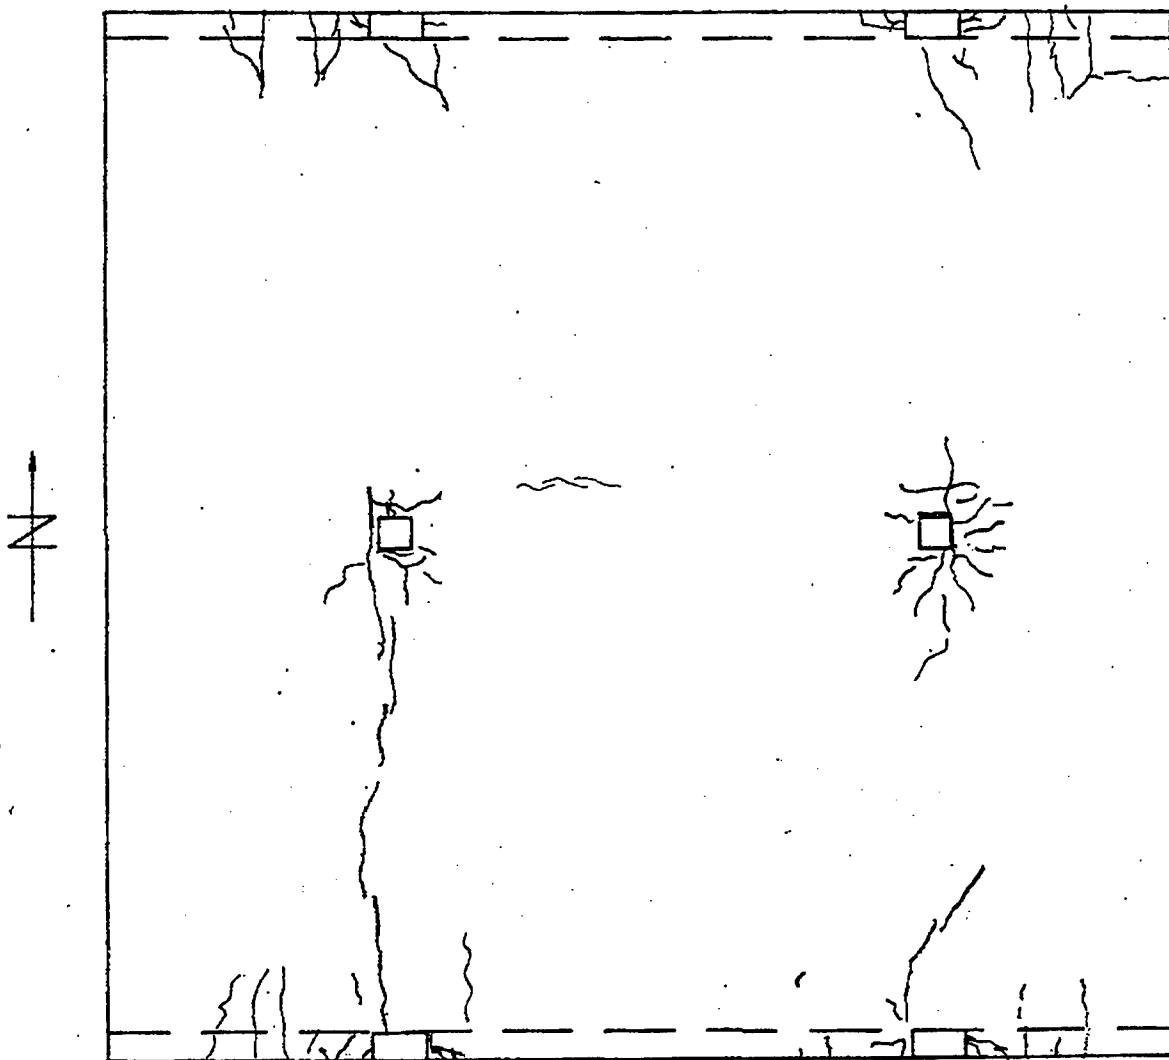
Crack Pattern, Second Floor Slab, Top Side, Post-T420DL
